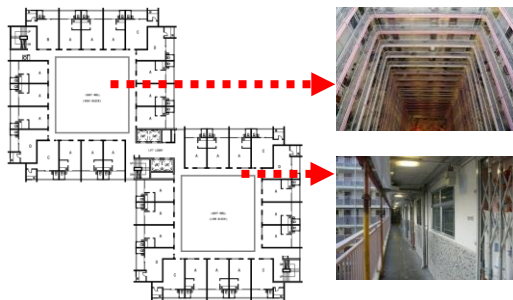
Typical floor plan of “Twin-building” design, Single loaded corridor phase II, Source: HKHA, 2012
